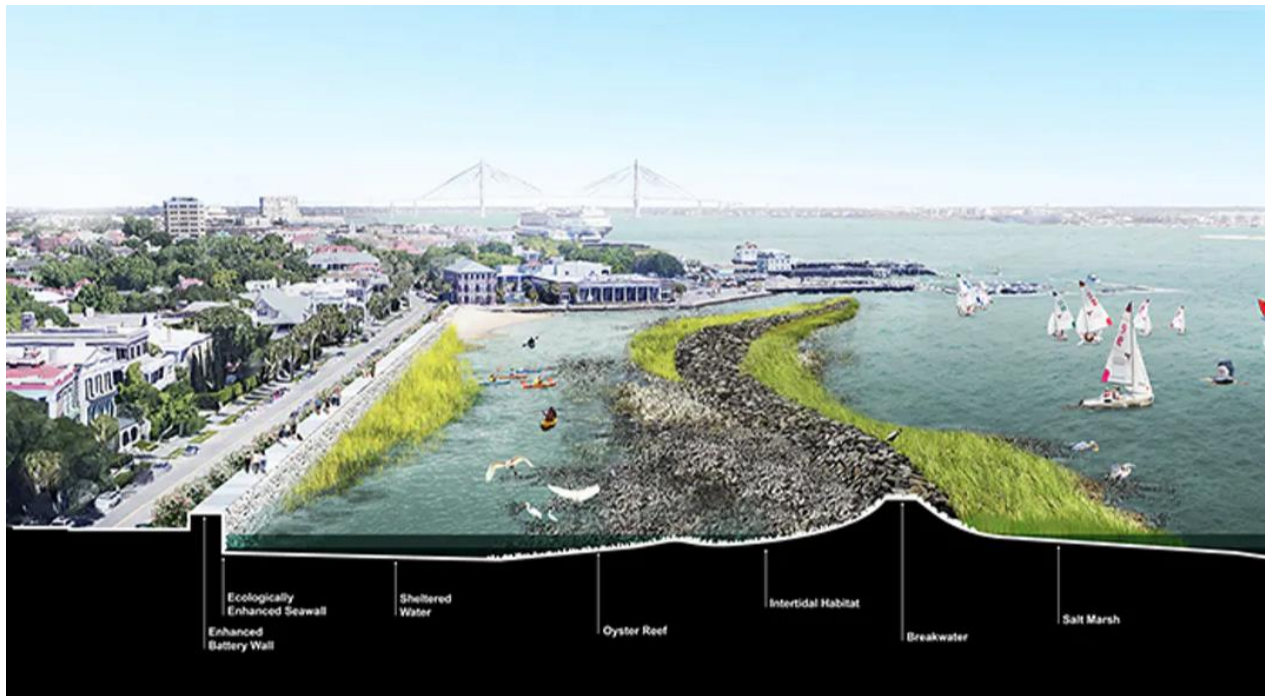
Plan for the inclusion of NBS into future plans for hazard mitigation and protection in Charleston (Imagine the Wall 2021).
